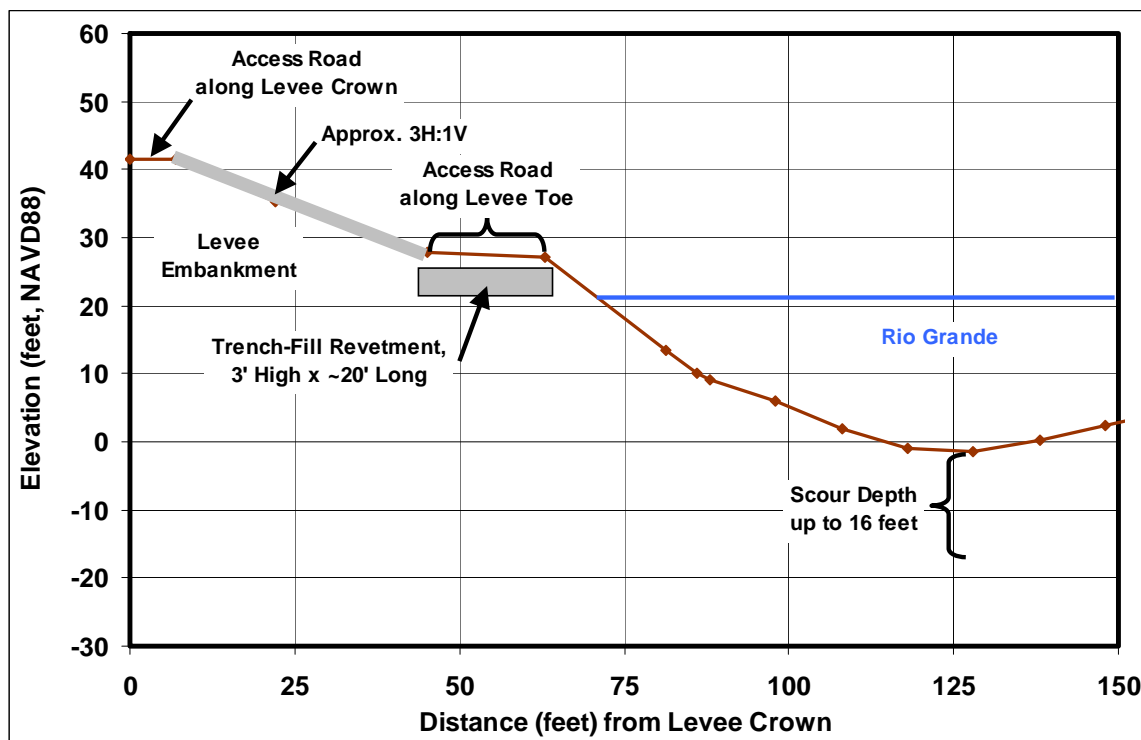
Embankment Protection – Trench-Fill Placement of Launching Stone
